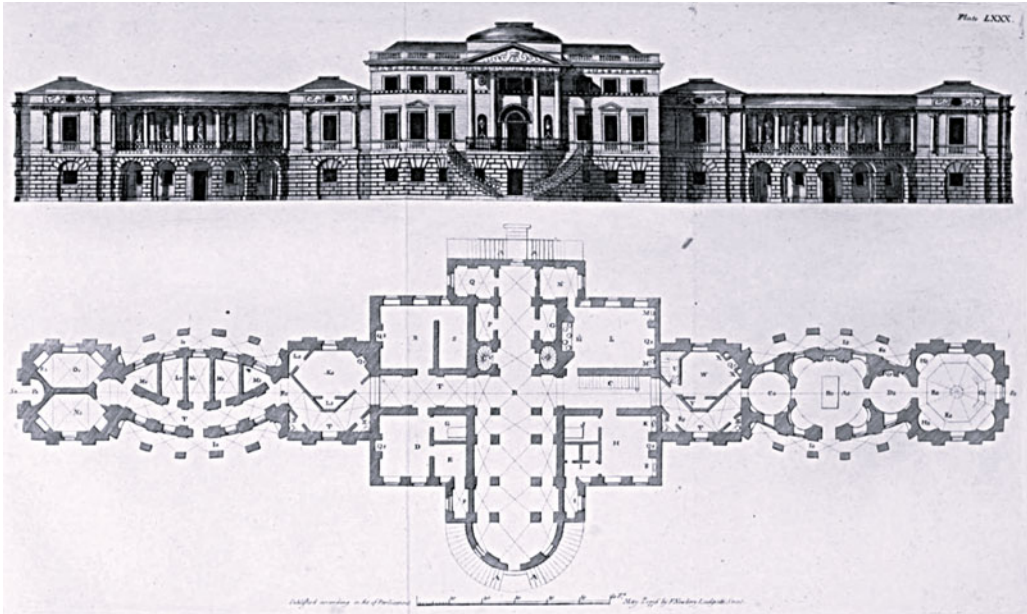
John Carter, plan of the ground floor of Bywell Hall, from *Builder's Magazine* 1776, pl LXXX. Source: Internet Archive.
